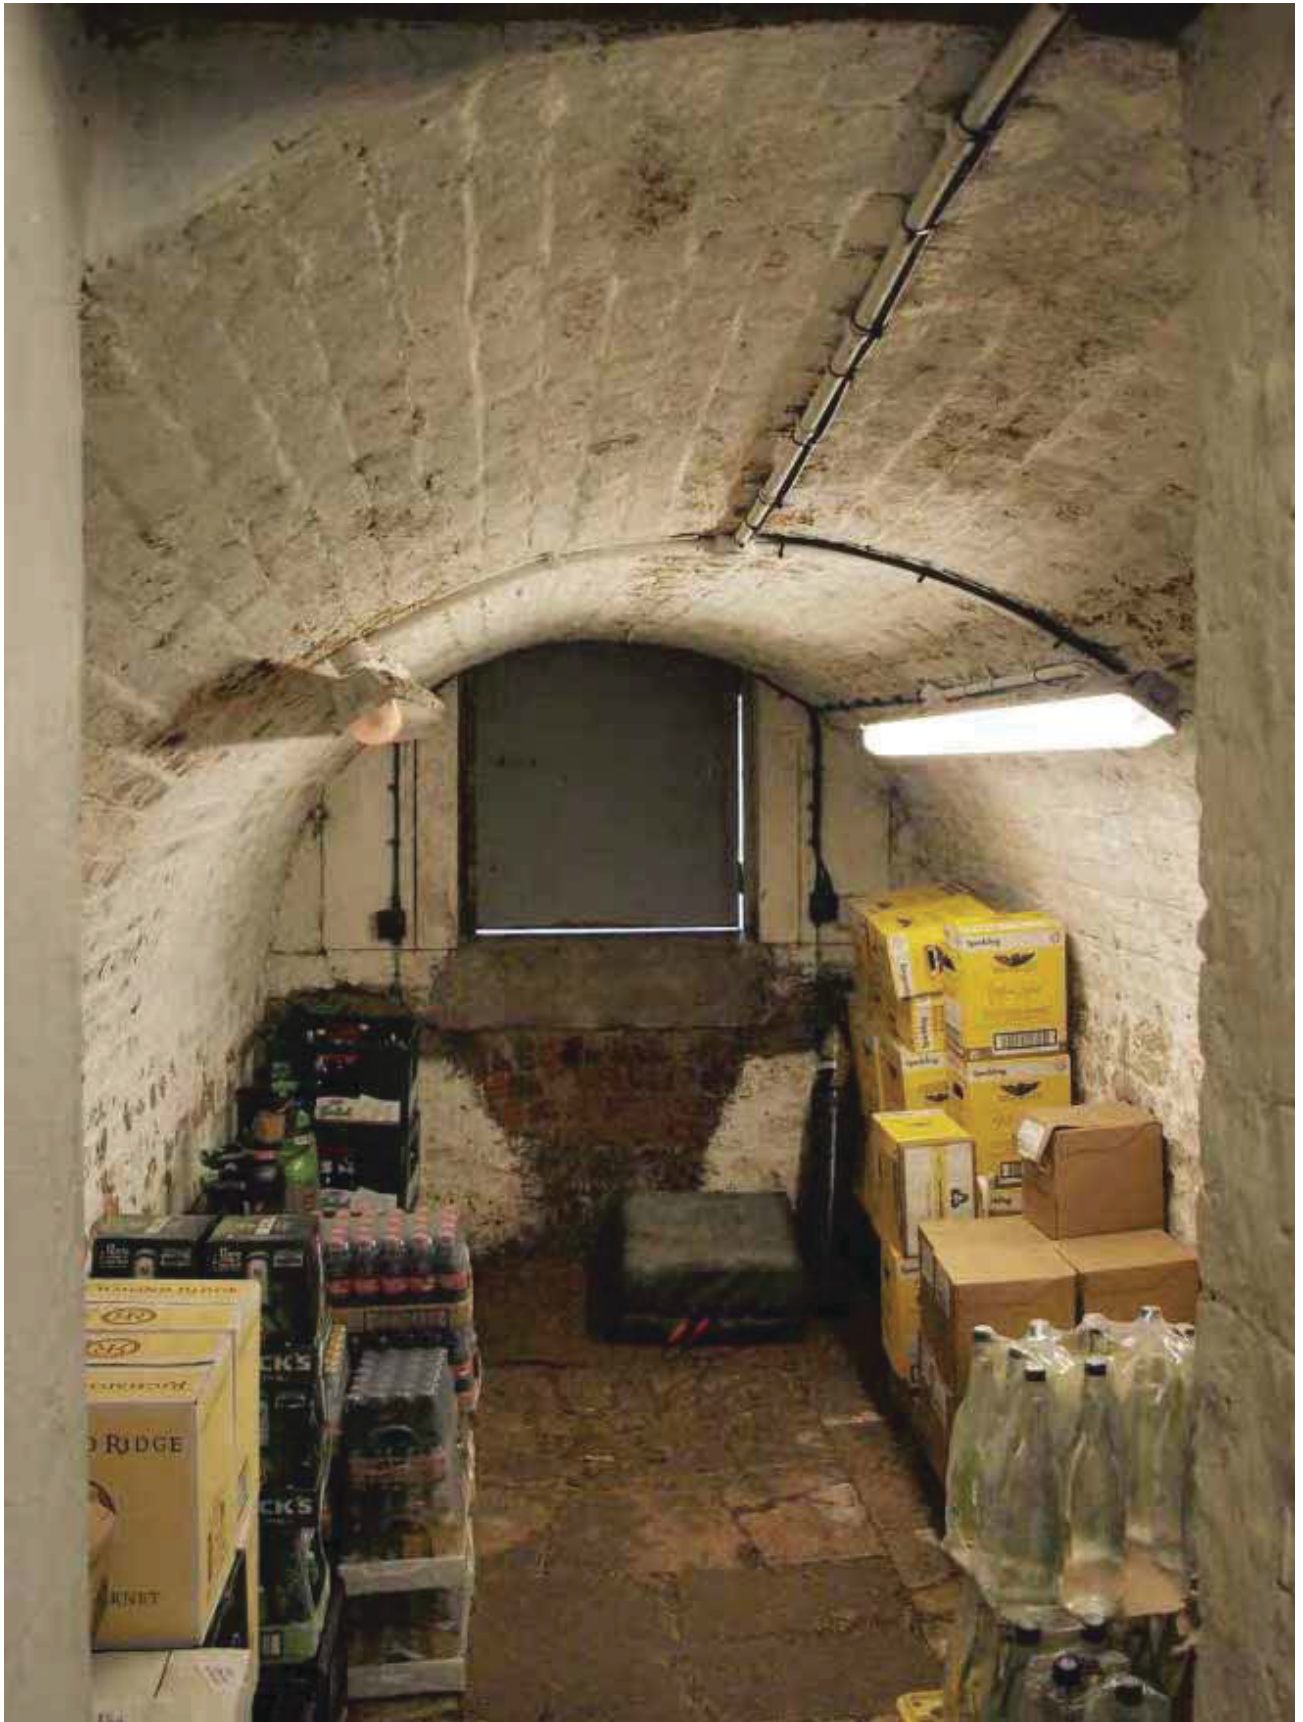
Bottle and barrel delivery area G19 to be redecorated with new stone floor
